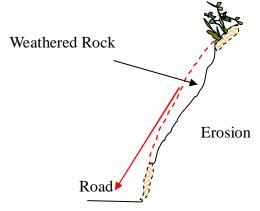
Rock Slope Collapse (RC) along Cebu-Balamban Road (km 1027)
